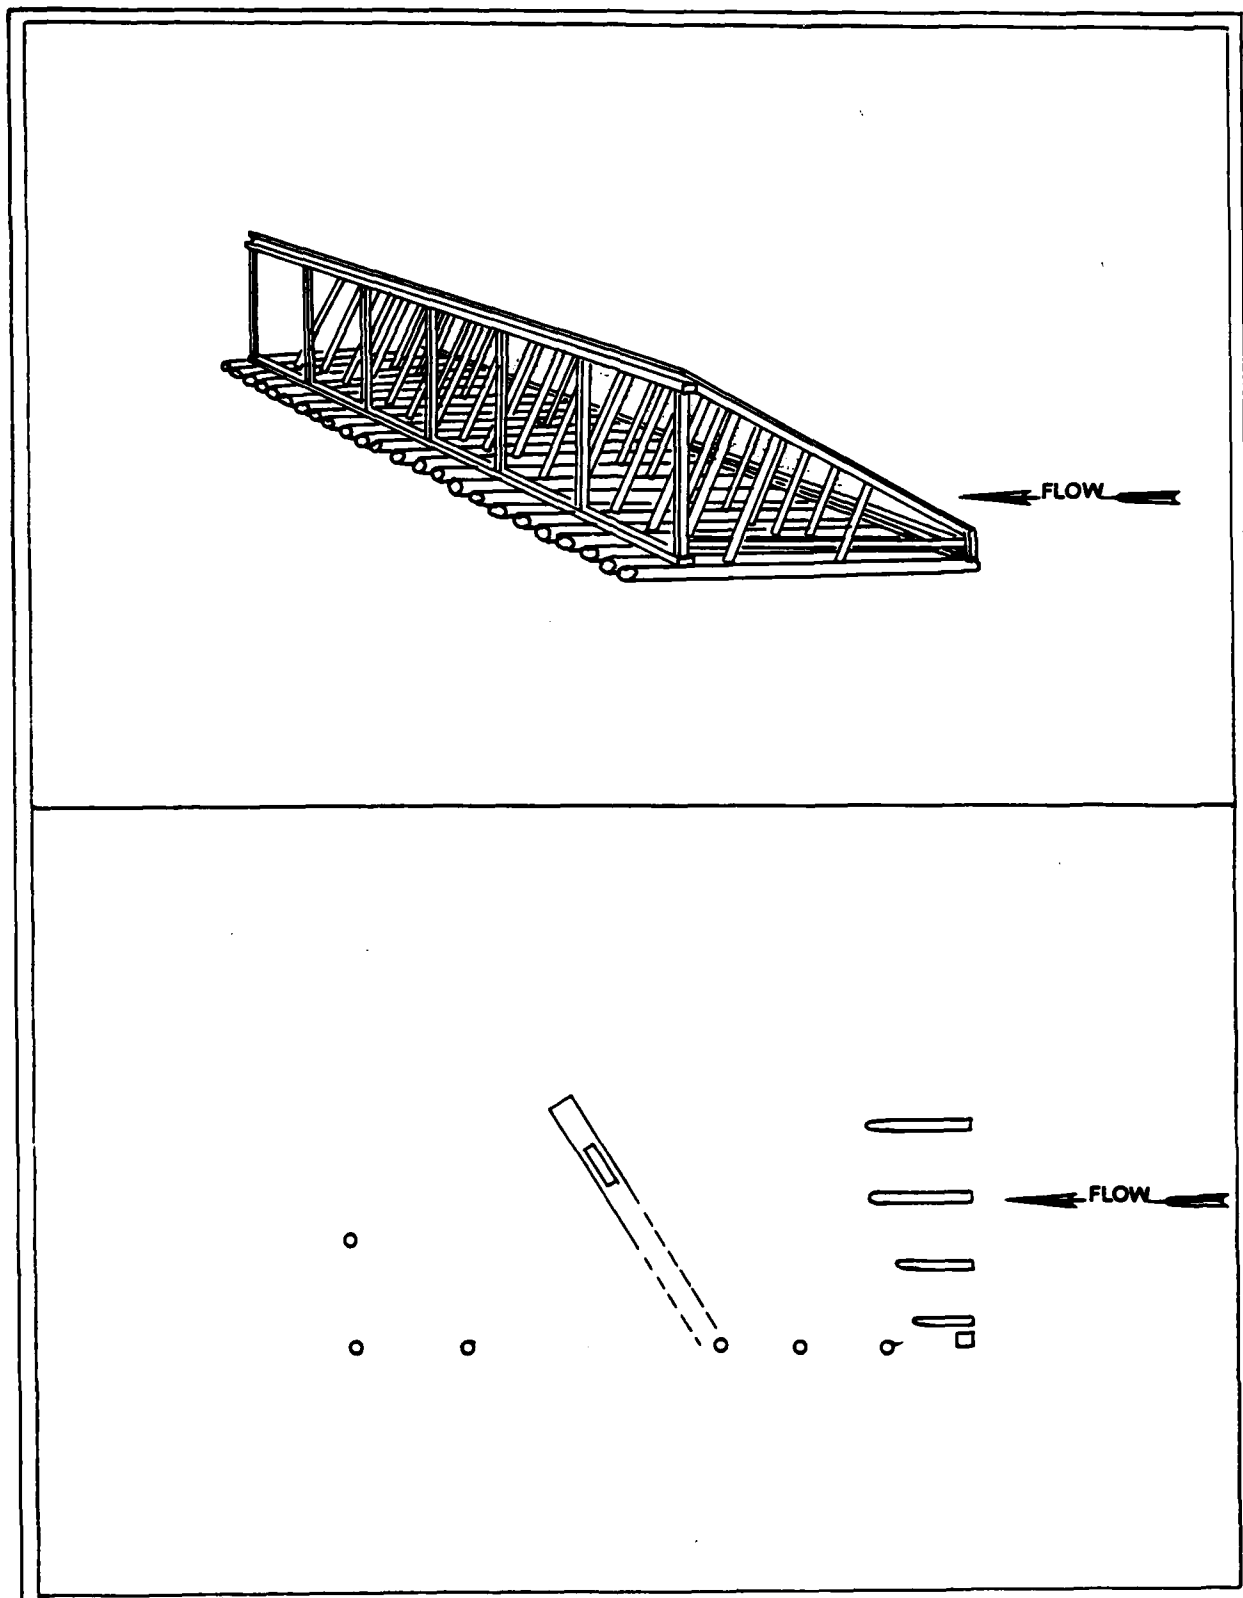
Typical Wooden Frame Dam and Remains of the Bay Springs Dam.
